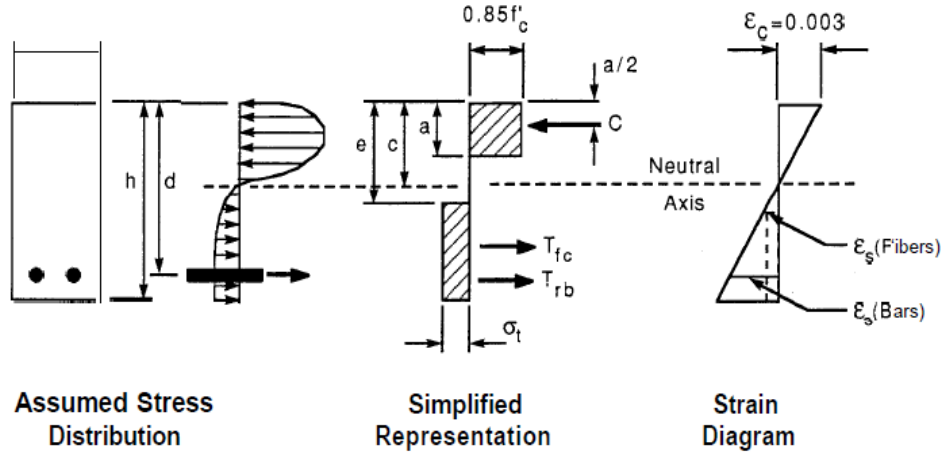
Design assumptions for analysis of a singly-reinforced concrete beams containing steel fibers, (Henager and Doherty, 1976)
